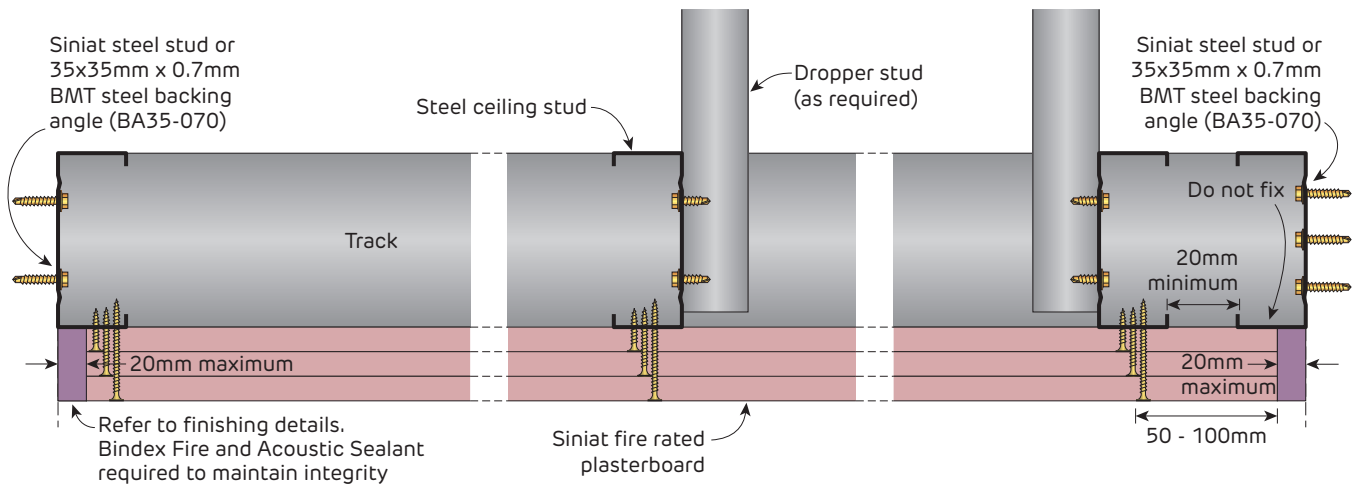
Stud Ceiling Type A2 - Fixed / Sliding
